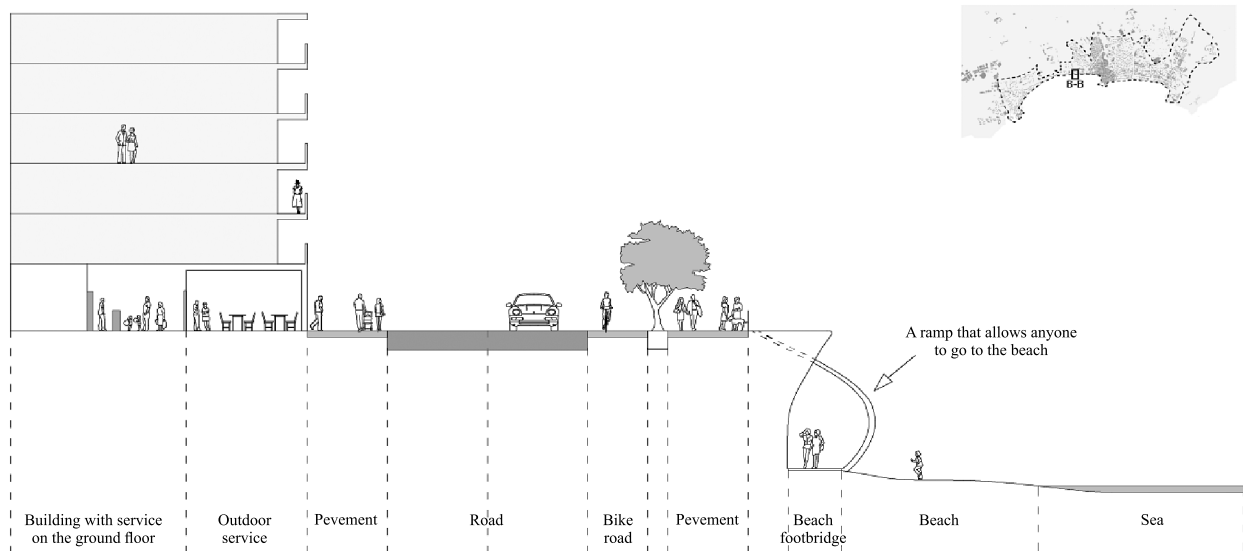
Section B-B. Sections of selected street in Benidorm, 5–6 storey buildings
